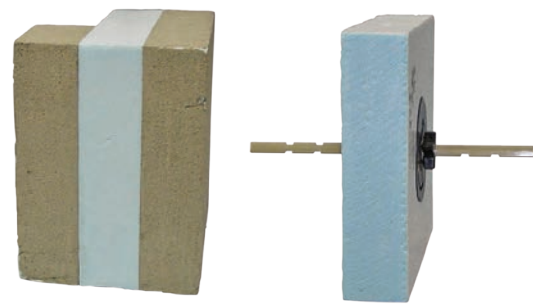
Center-insulated concrete wall (left) and insulation with concrete tie (right). (Sanford)
